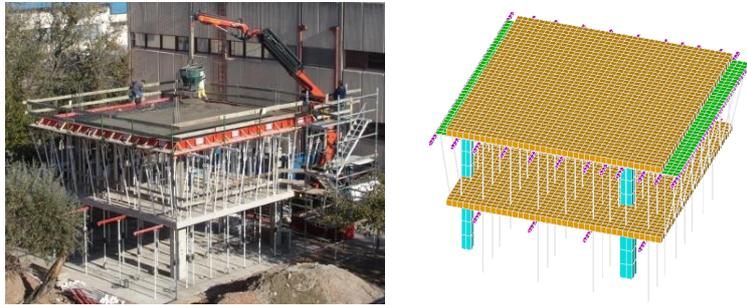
Building under construction during the cast of the second slab (left) and its numerical simulation (right).
